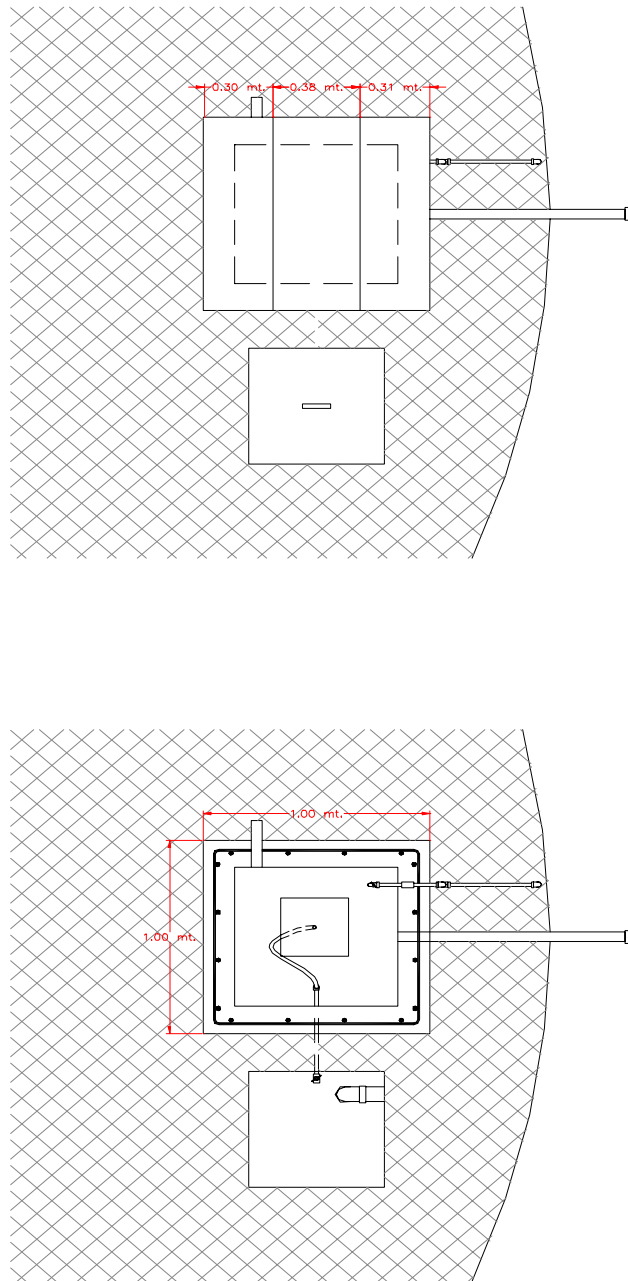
Profile view cross section details of brick floor and air vent.
